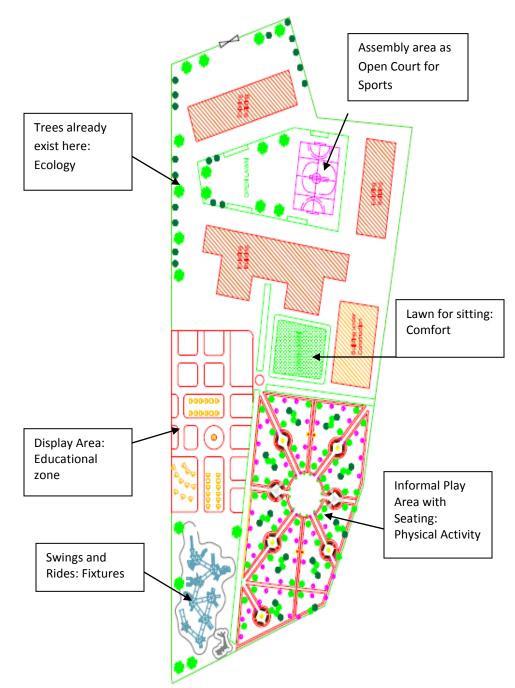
Plan for schoolyard at Government Girls High School, Afzal Town, Rawalpindi
